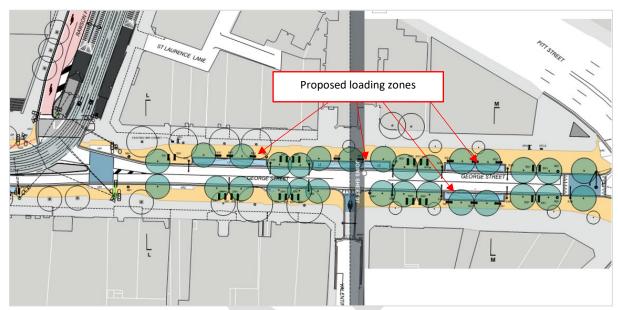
Extract of proposed concept plan with proposed loading zones highlighted
